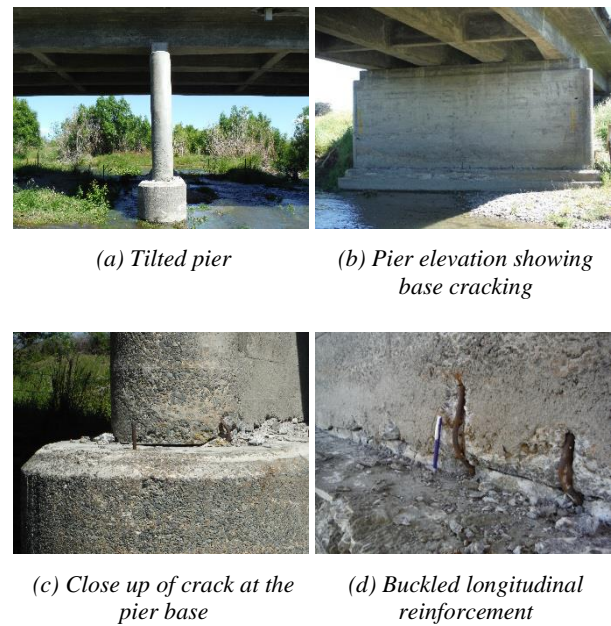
Pier damage at the Flaxbourne River Bridge.
